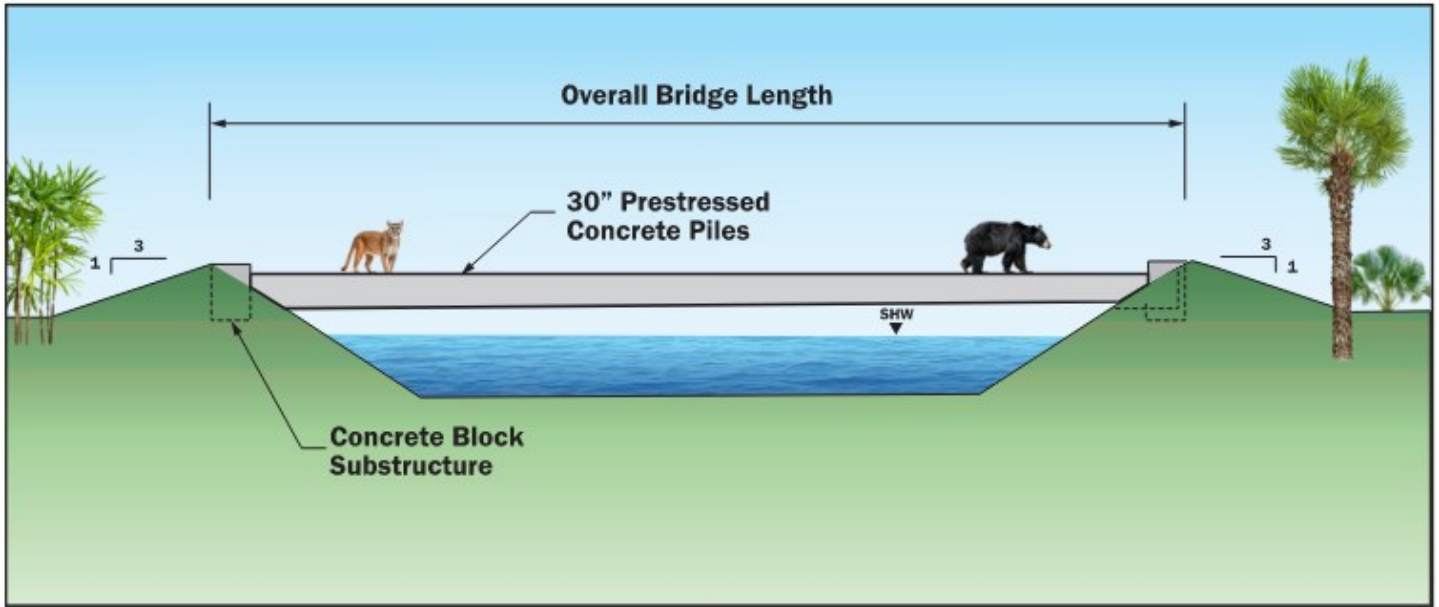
Concrete pile bridge canal crossing with end blocks for substructure.
